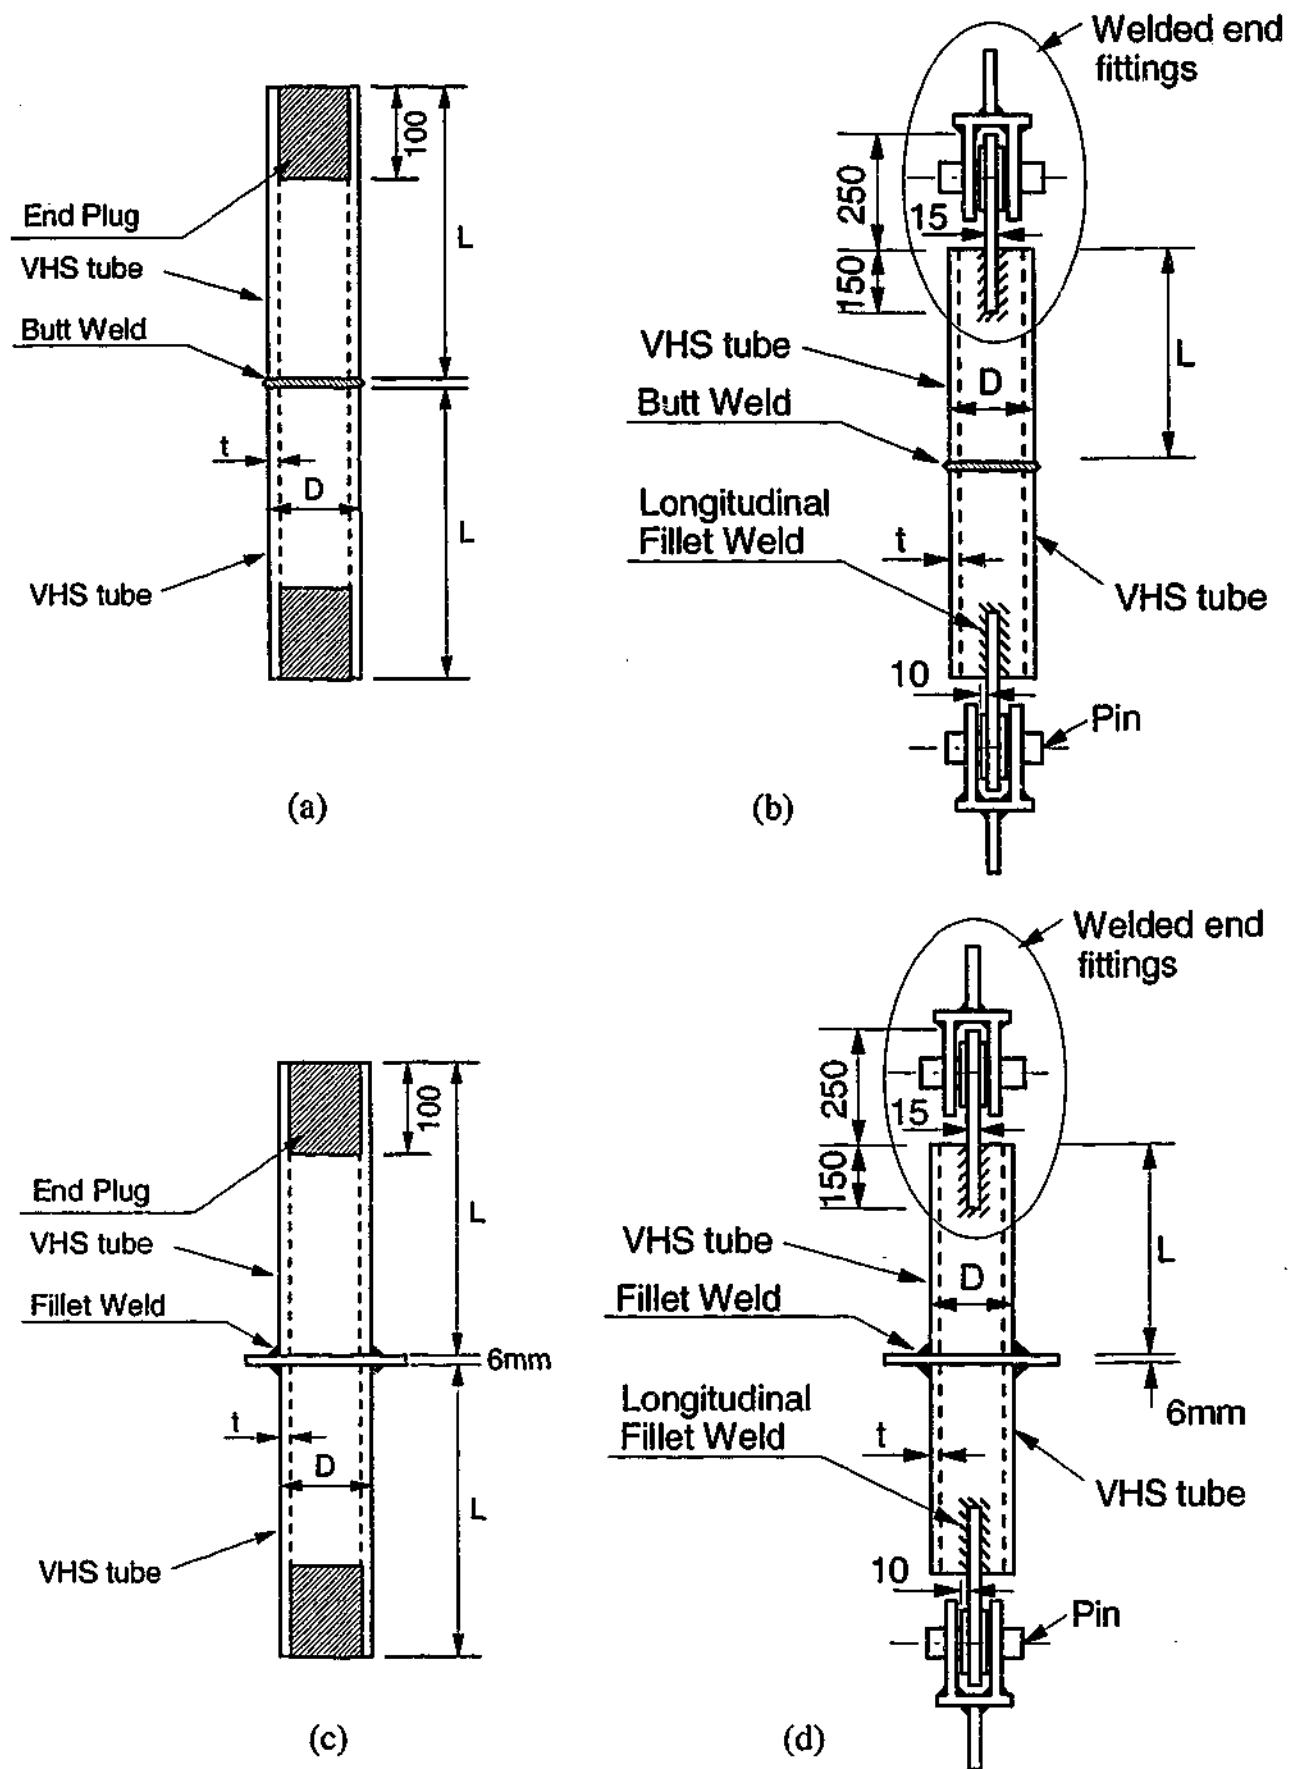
Loading arrangement: (a) butt welded connections through end plugs for tube size $D \leq 56\text{mm}$; (b) butt welded connections through welded end fittings for tube size $D > 56\text{mm}$; (c) transverse fillet welded connections through end plugs for tube size $D \leq 56\text{mm}$; (d) transverse fillet welded connections through welded end fittings for tube size $D > 56\text{mm}$
